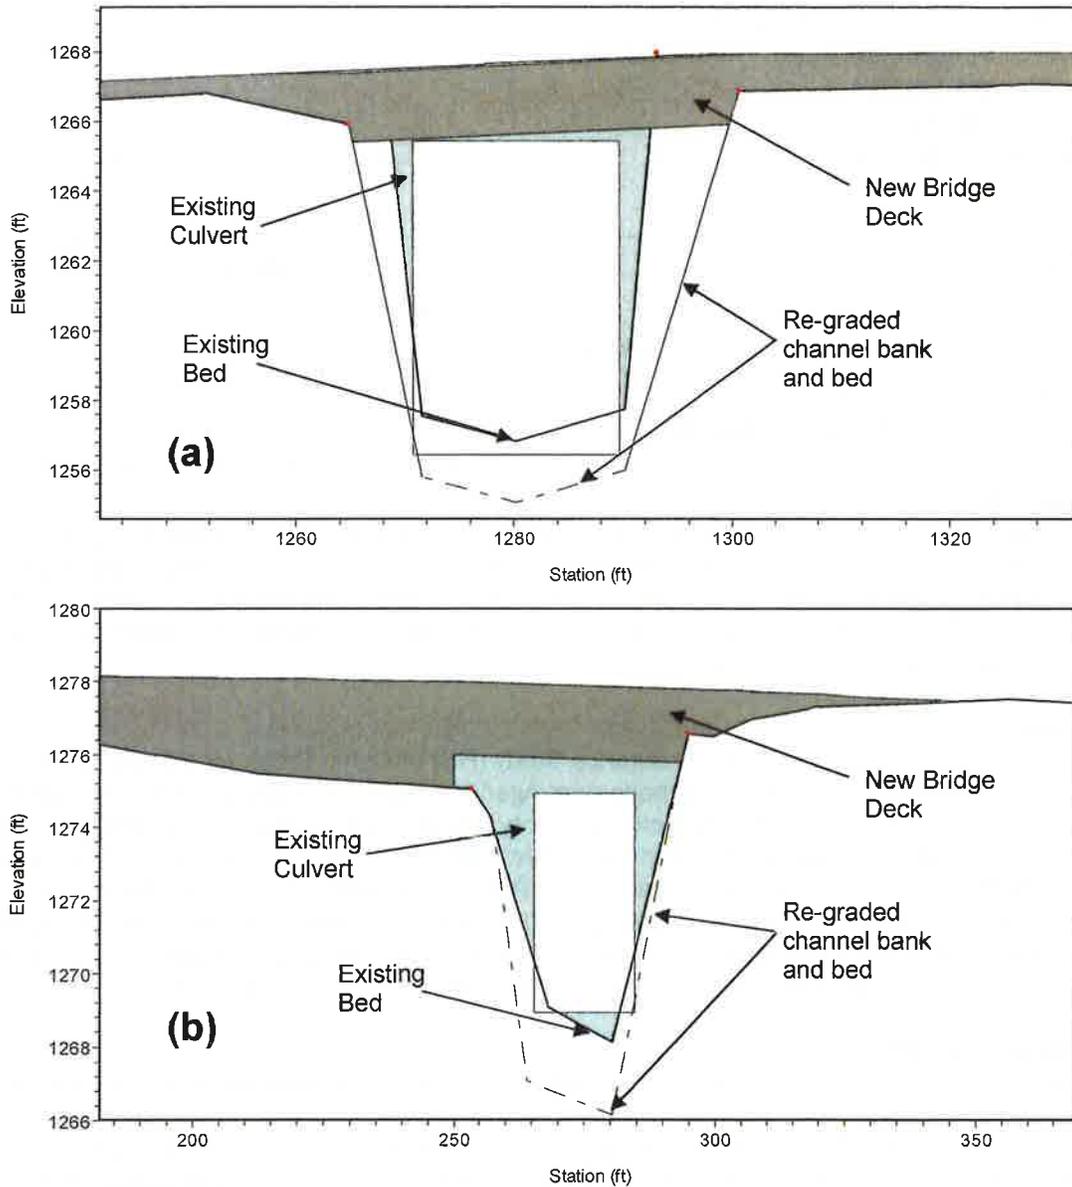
Bridge and cross-section modifications at (a) Taylor Avenue, and (b) West Pine Street.
